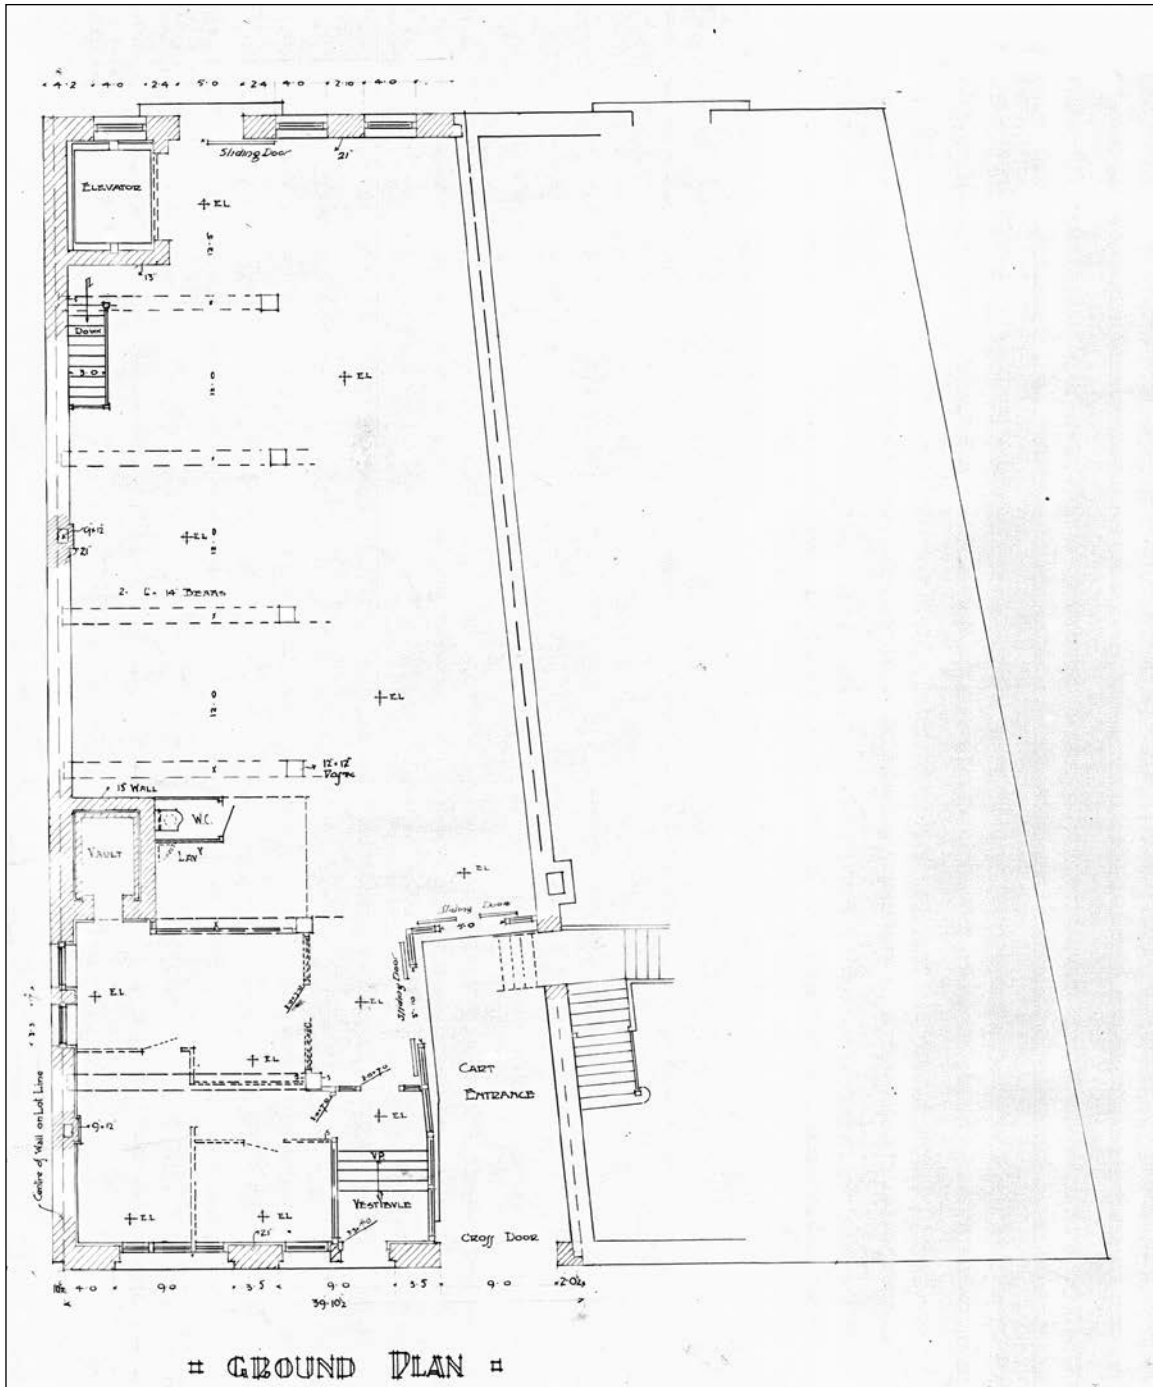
Architect’s plans, #1558/1907, “Ground Plan.” (City of Winnipeg, Clerks Department.)
